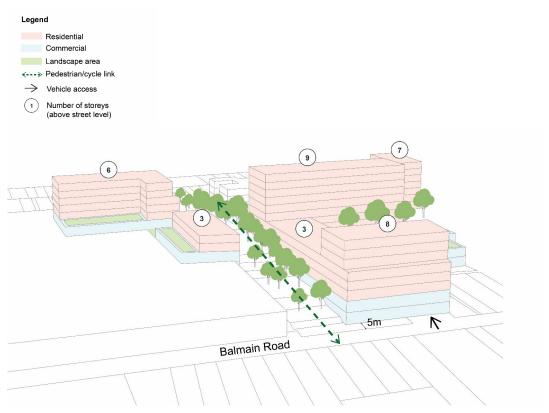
Norton Street Opportunity Site - axonometric view from Balmain Road and McDonald Street
